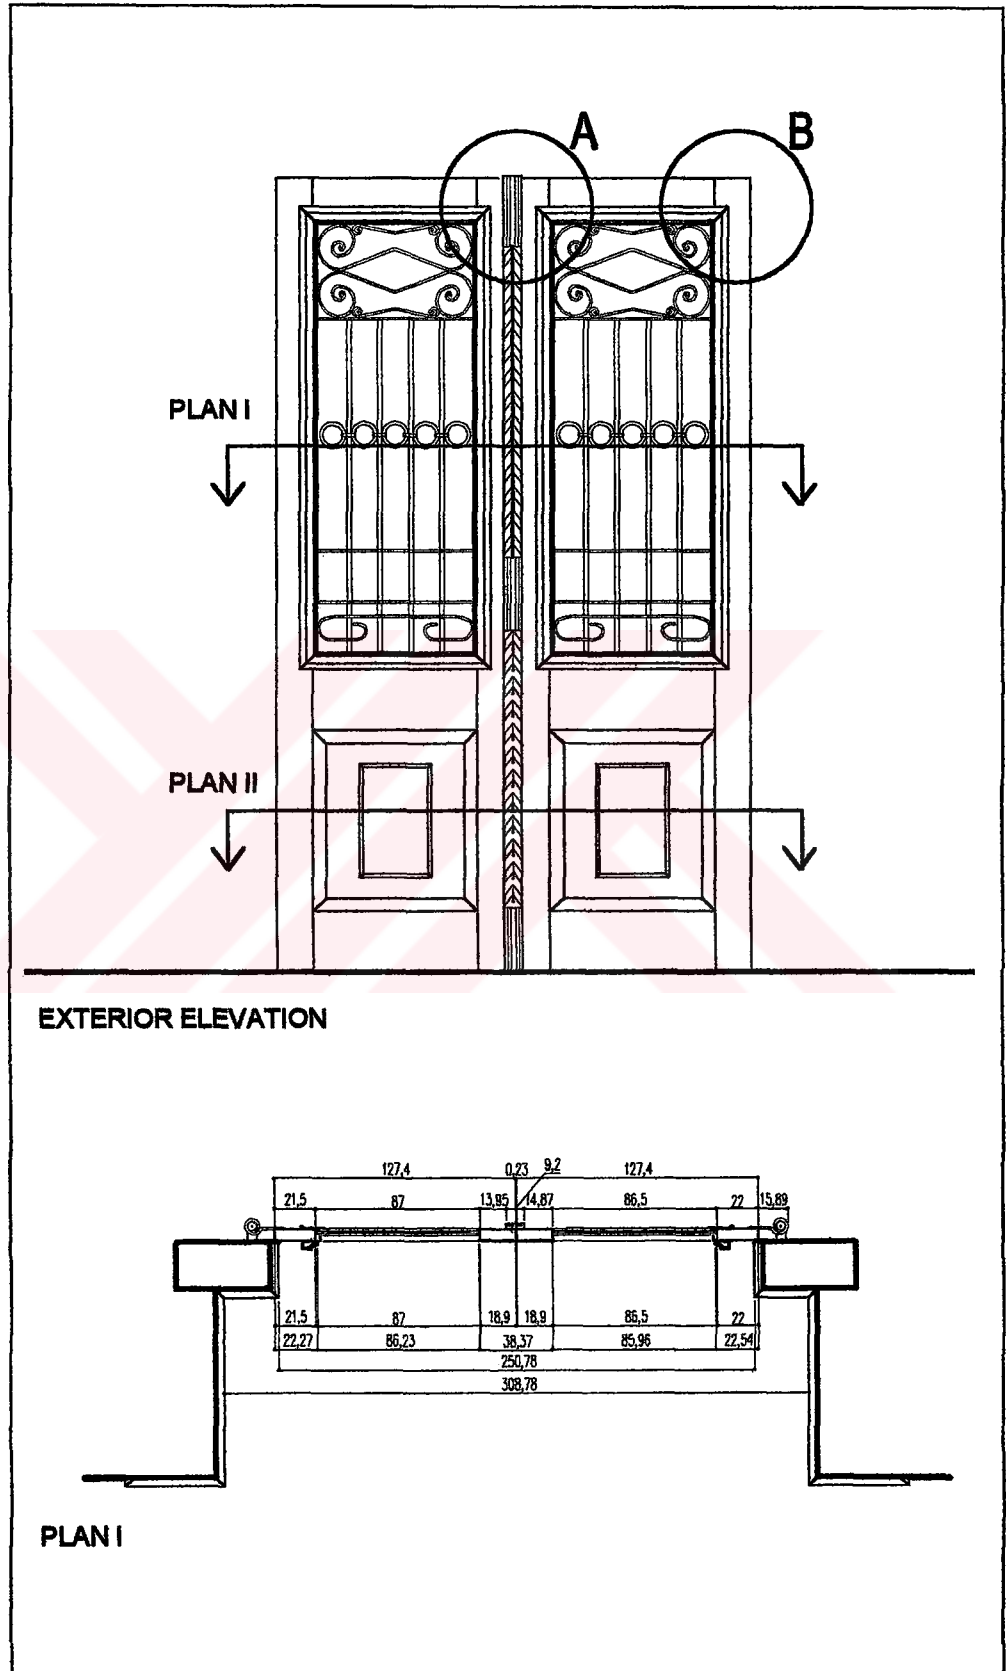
DW04A-İzmir Caddesi No:54 Exterior Elevation and Plan
